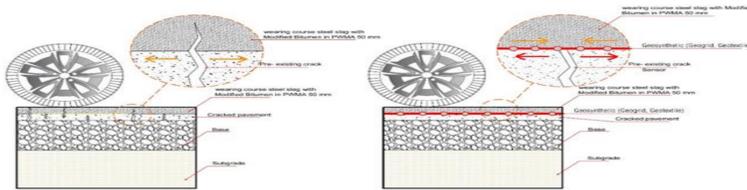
Performance of reinforcement pavement with Geosynthetics and EAF compared with conventional pavement
